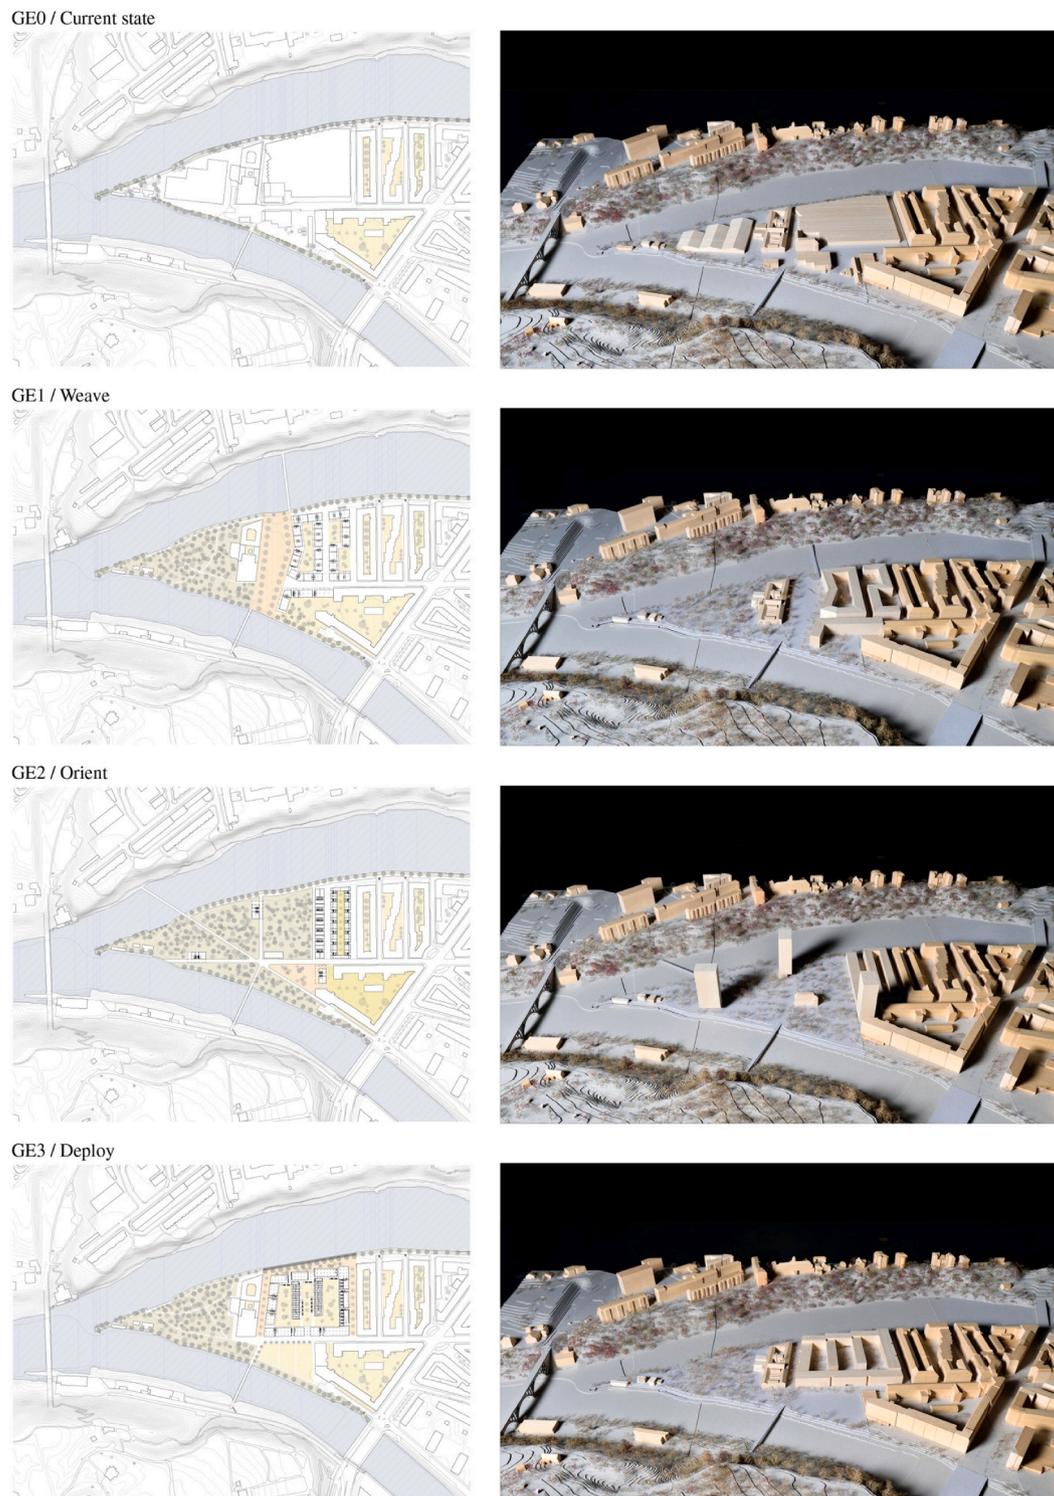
Ground floor plans and models. [photos © Olivier Wavre].
